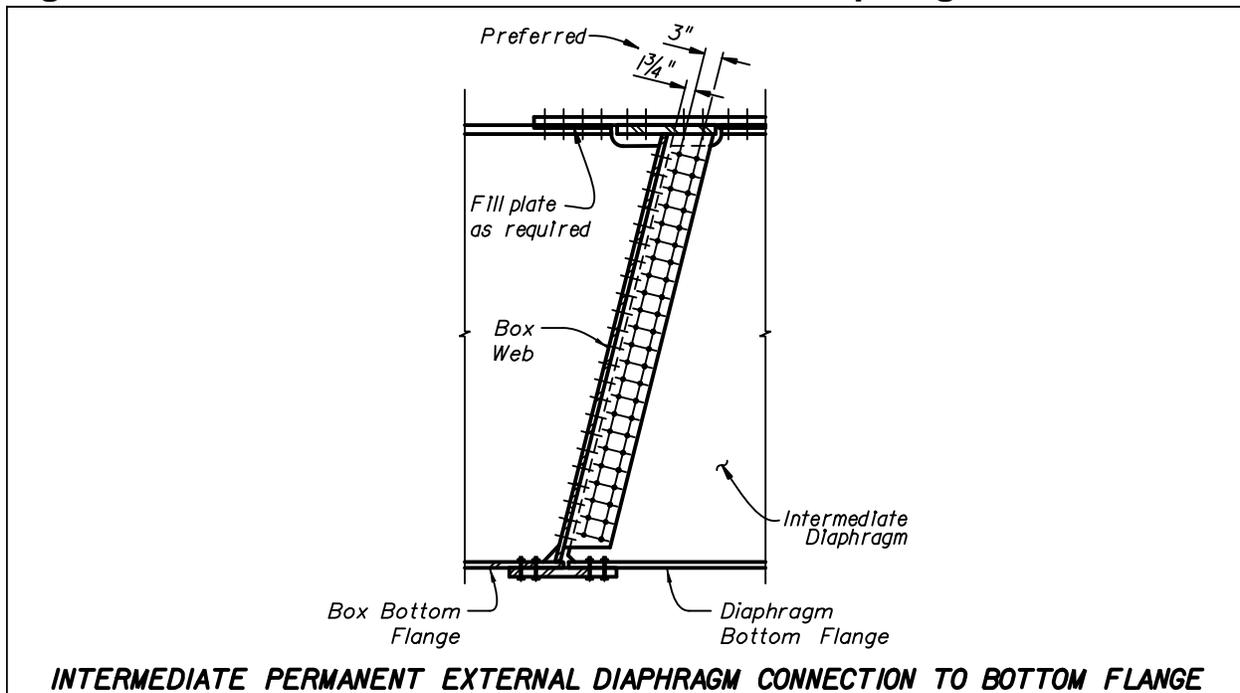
Steel Box Girder Intermediate Diaphragm Connection
